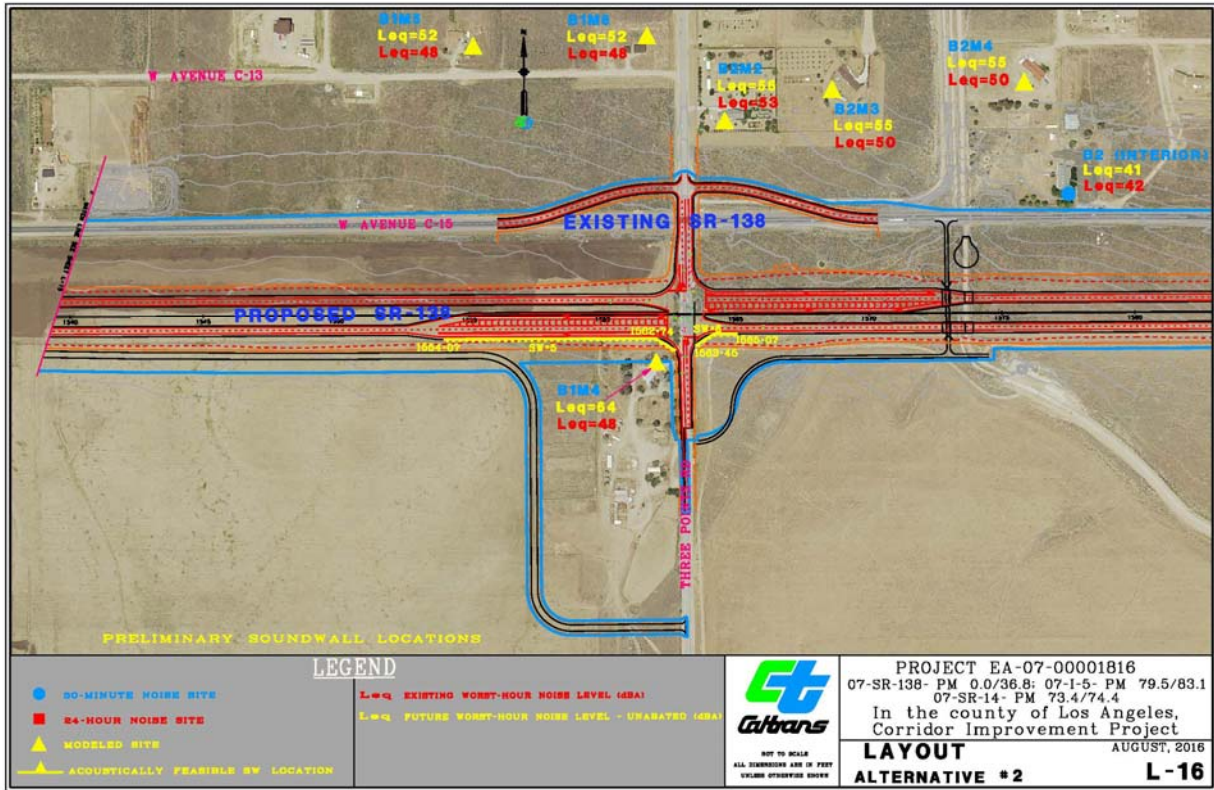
Alternative 2 Soundwall Location – 7 and 8 (sheet 1 of 2)
